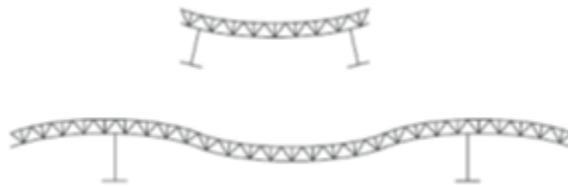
System II Stresses – Transverse Bending of the Deck between Girders
